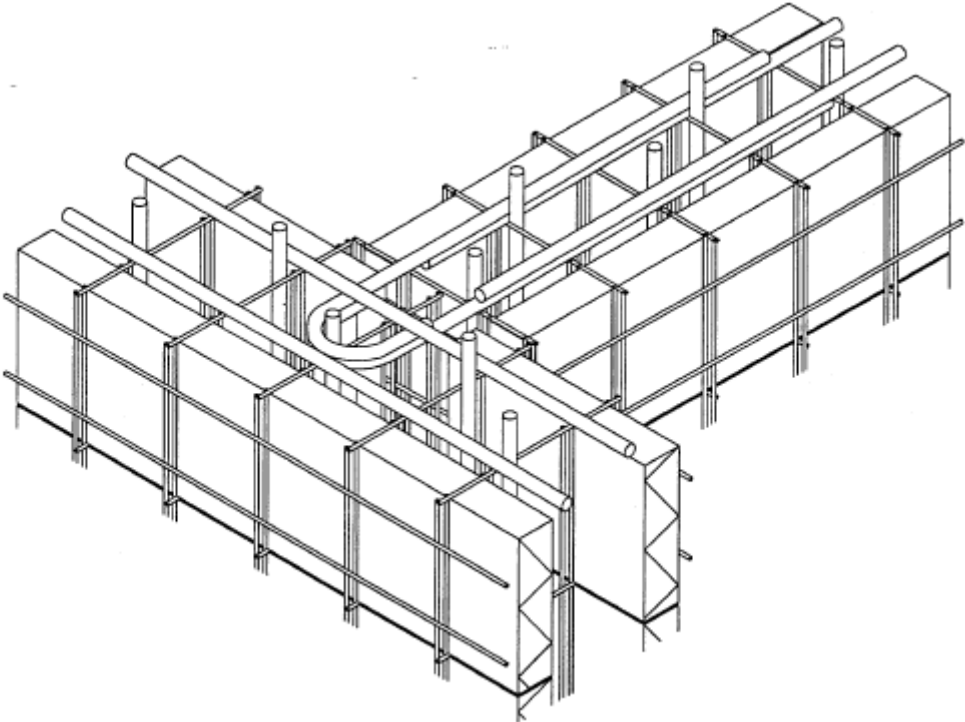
Example of a shuttering kit wall junction, with additional rebar
